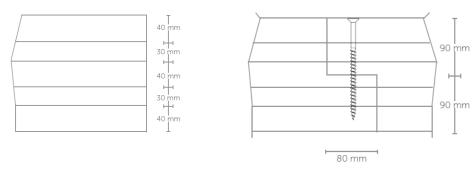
Layer structure of CLT 180 L5s and joint/screw detail of the slab
